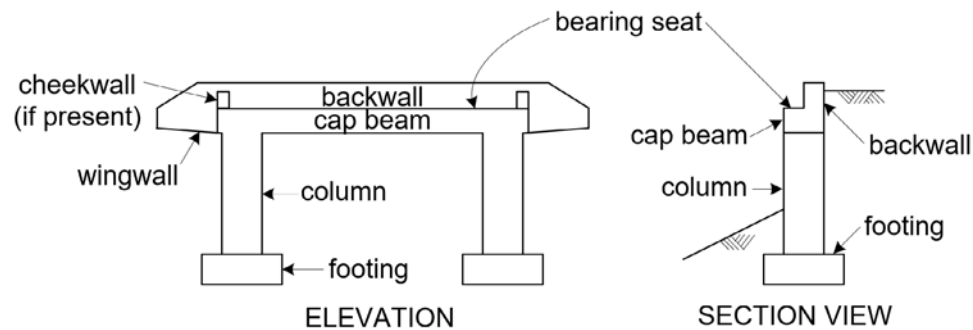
Sketch of Spill Through/Open Abutment
